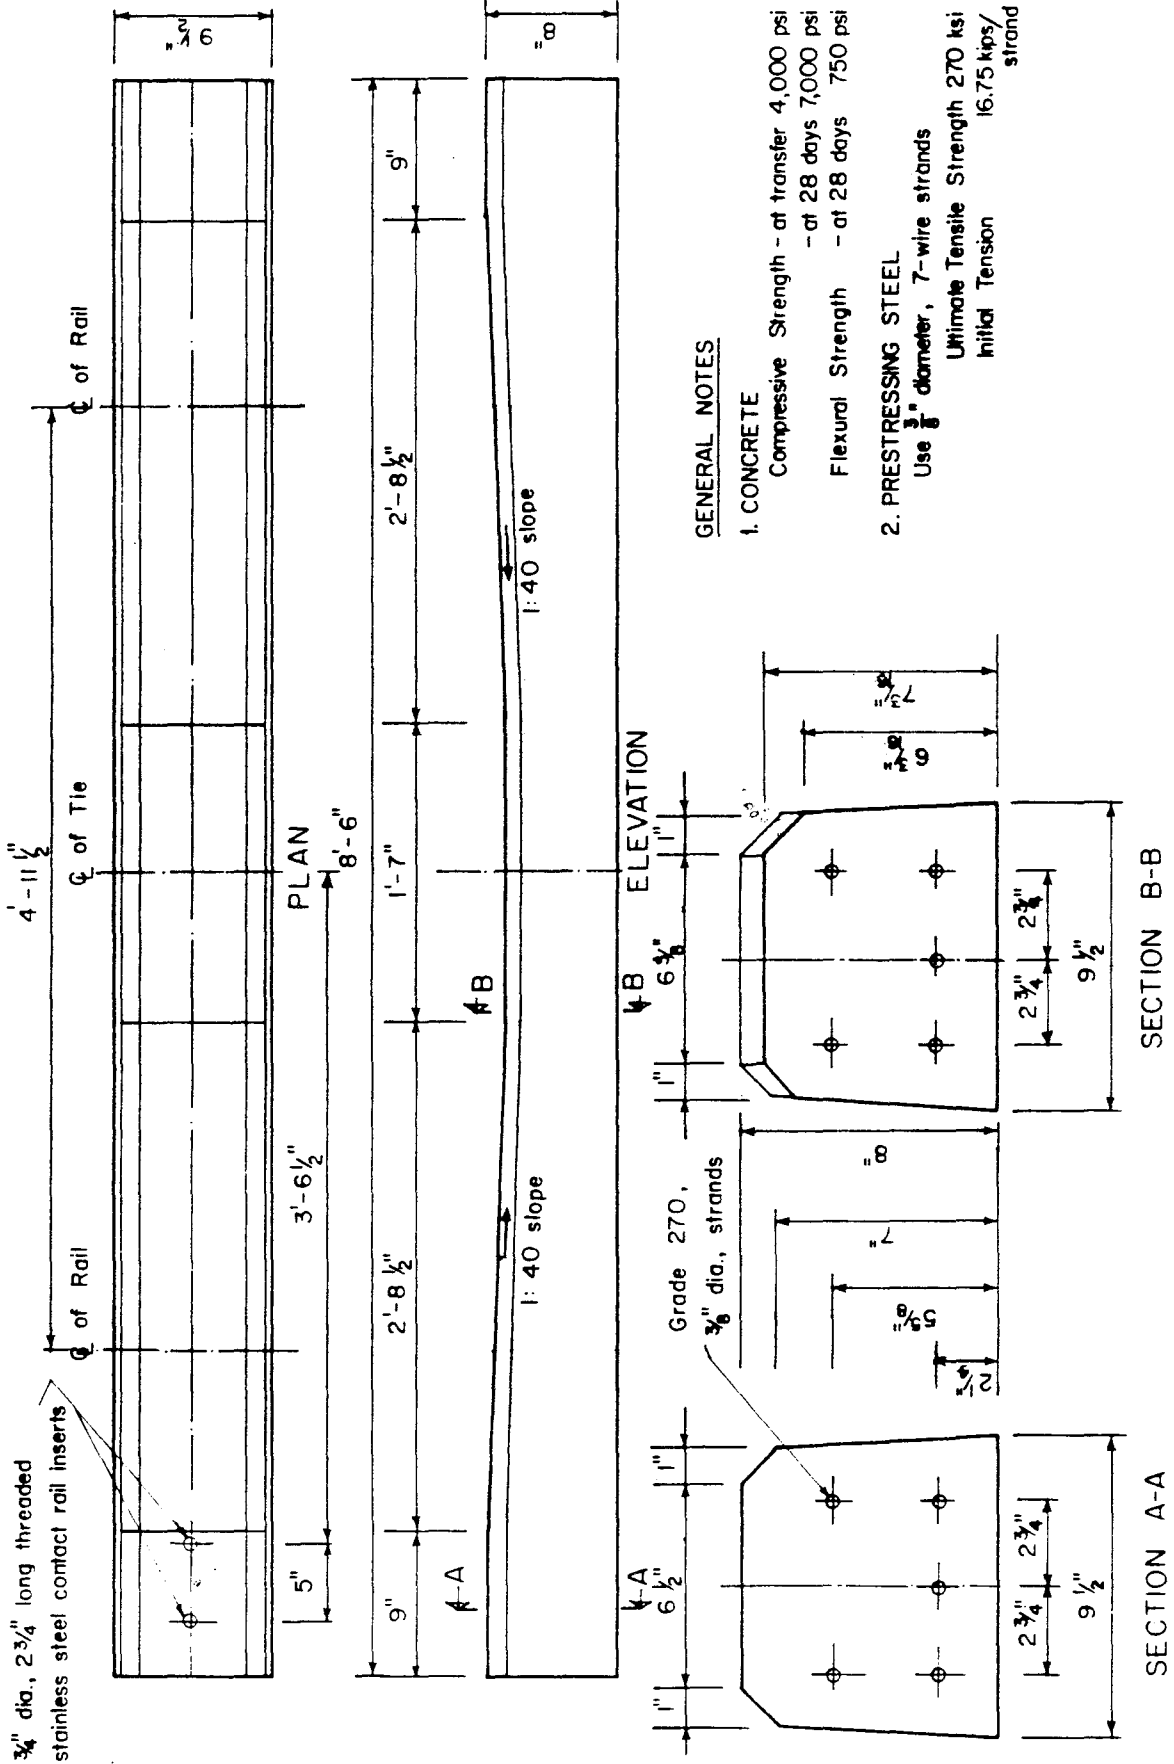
DETAILS OF PRETENSIONED MONOBLOCK TIE
